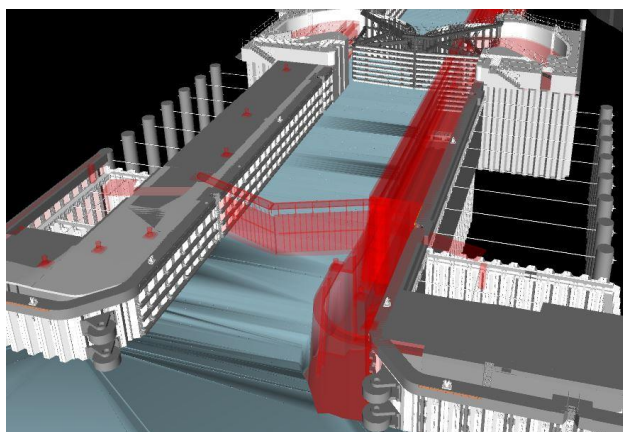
View of the upstream half of the WDE with existing (red) and proposed structures
